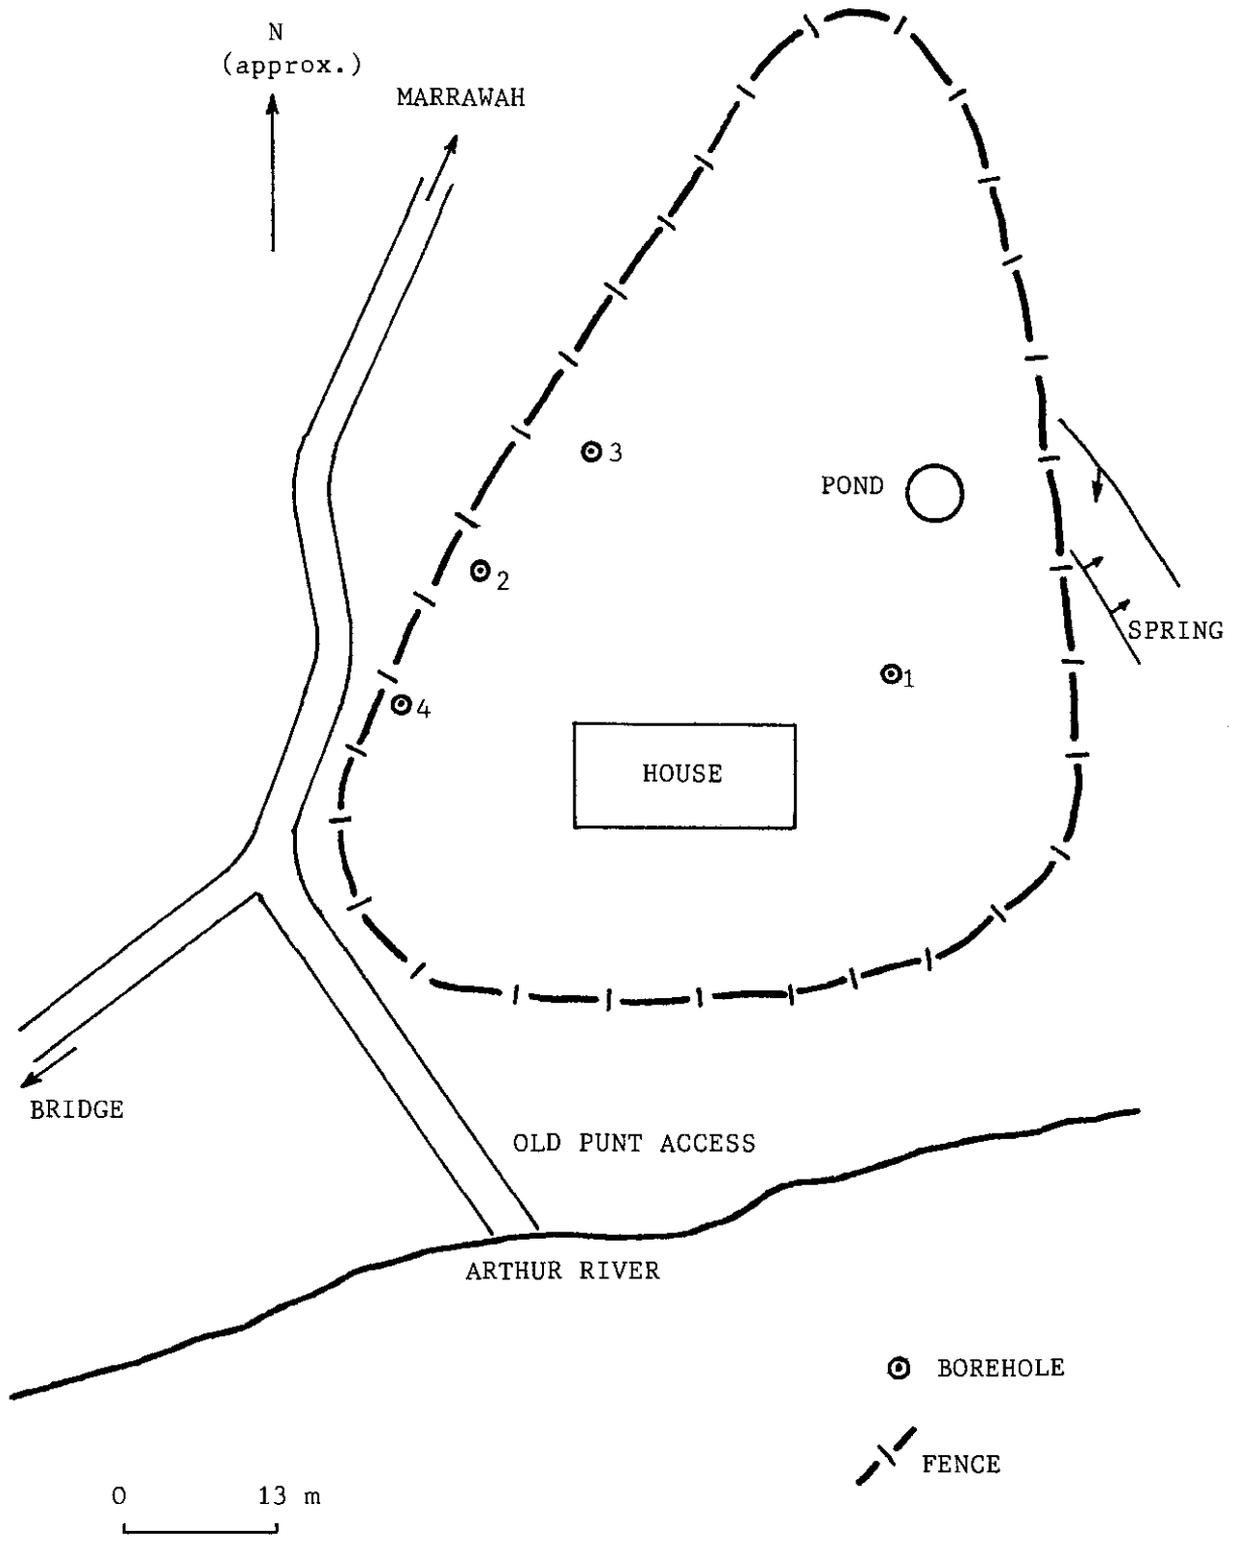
Sketch plan of area surrounding ranger's house, Arthur River
